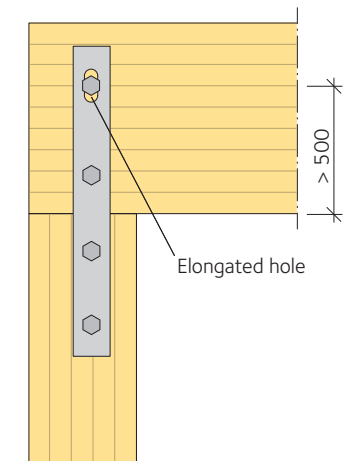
Example of glulam post-beam connection with flat steel plates and fastening with coach bolts
